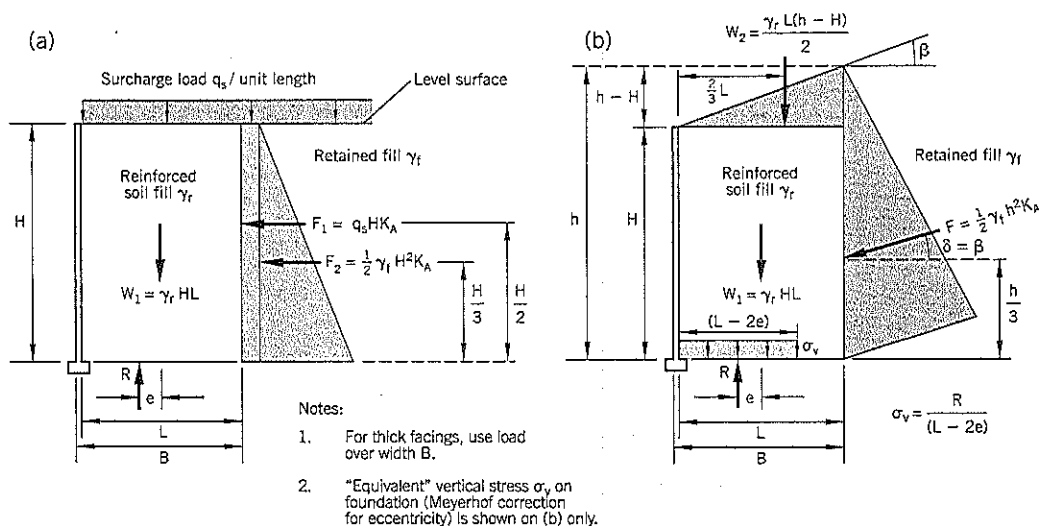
External lateral pressures acting on an MSE wall: (a) horizontal backslope (b) sloping backslope
